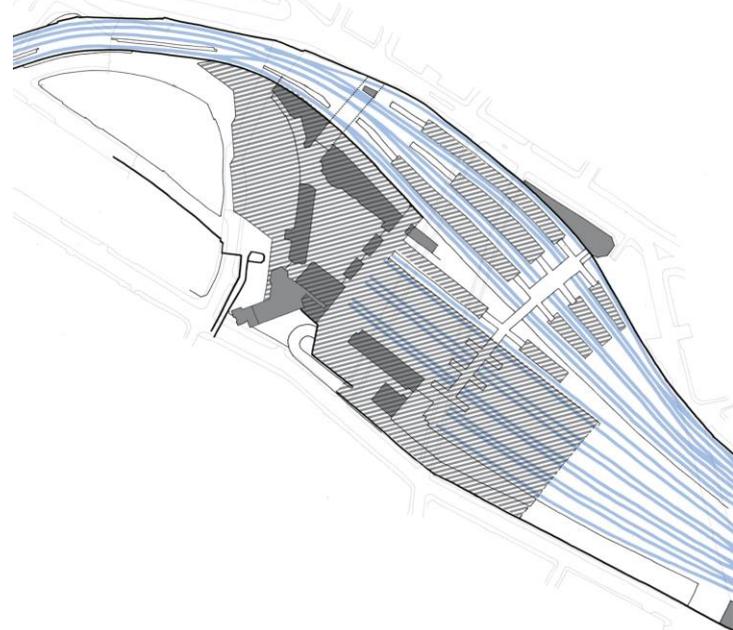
London Bridge station in 1983 (Alan Baxter)
